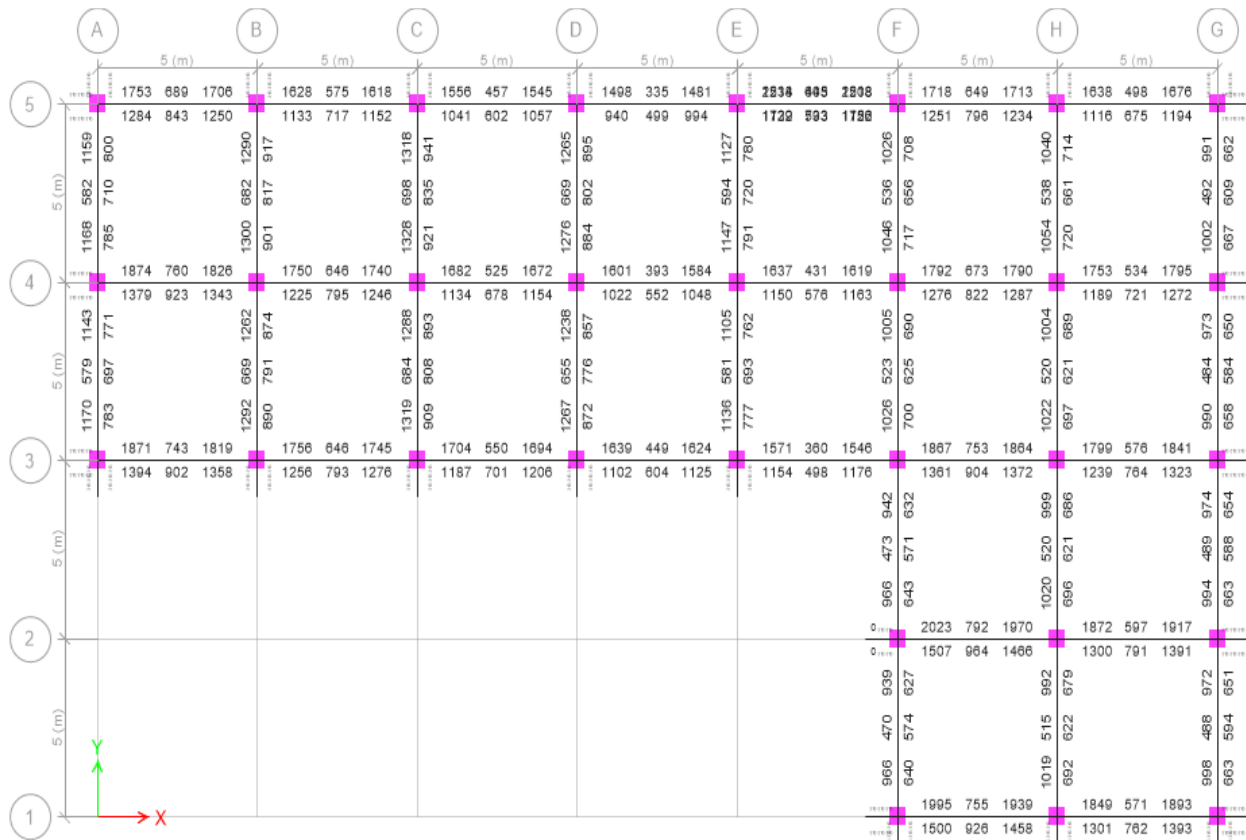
6 Sample design of buildings in the plan view for irregular plan model
